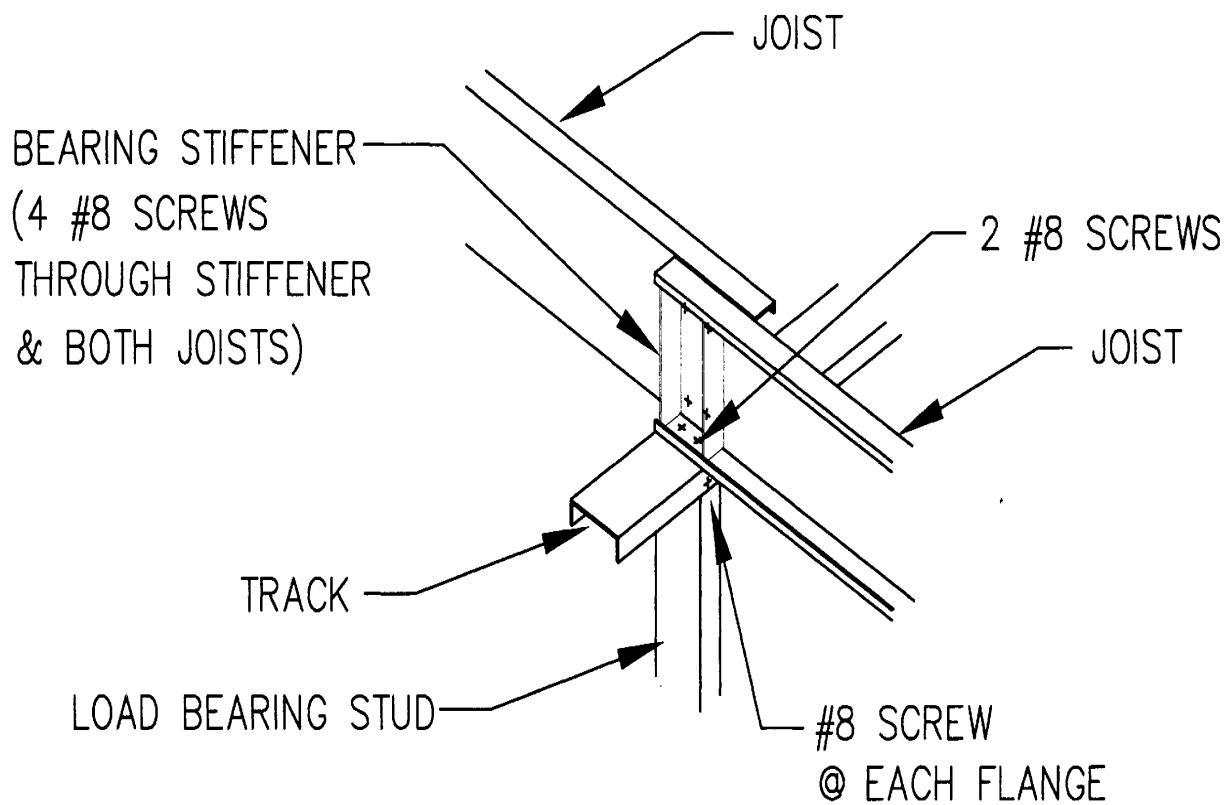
Lapped Joist Supported on Interior Load Bearing Wall
